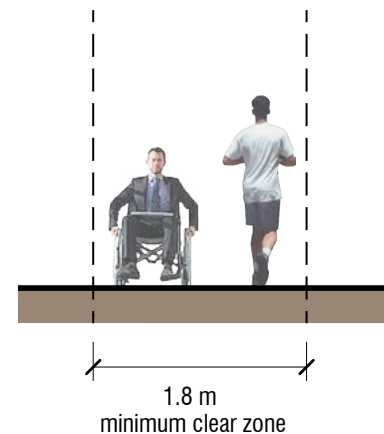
1.8 m is the minimum clear pedestrian zone on a downtown sidewalk
